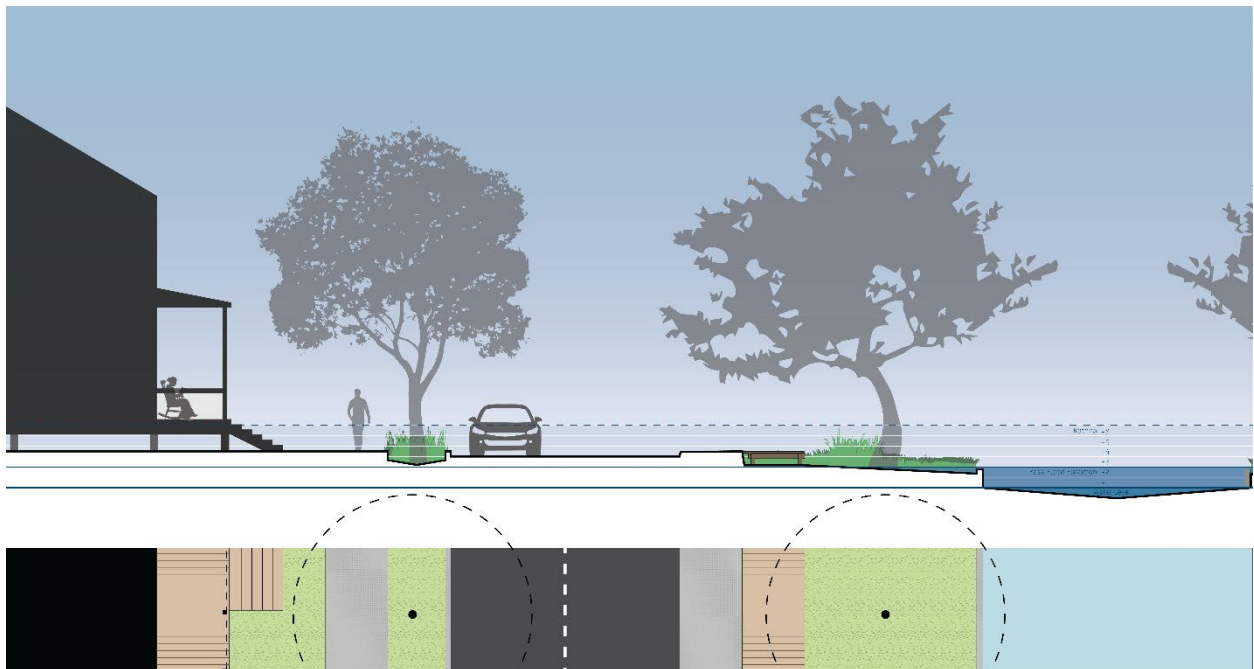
Section and street plan of a neighborhood swale. (Source: Author)
